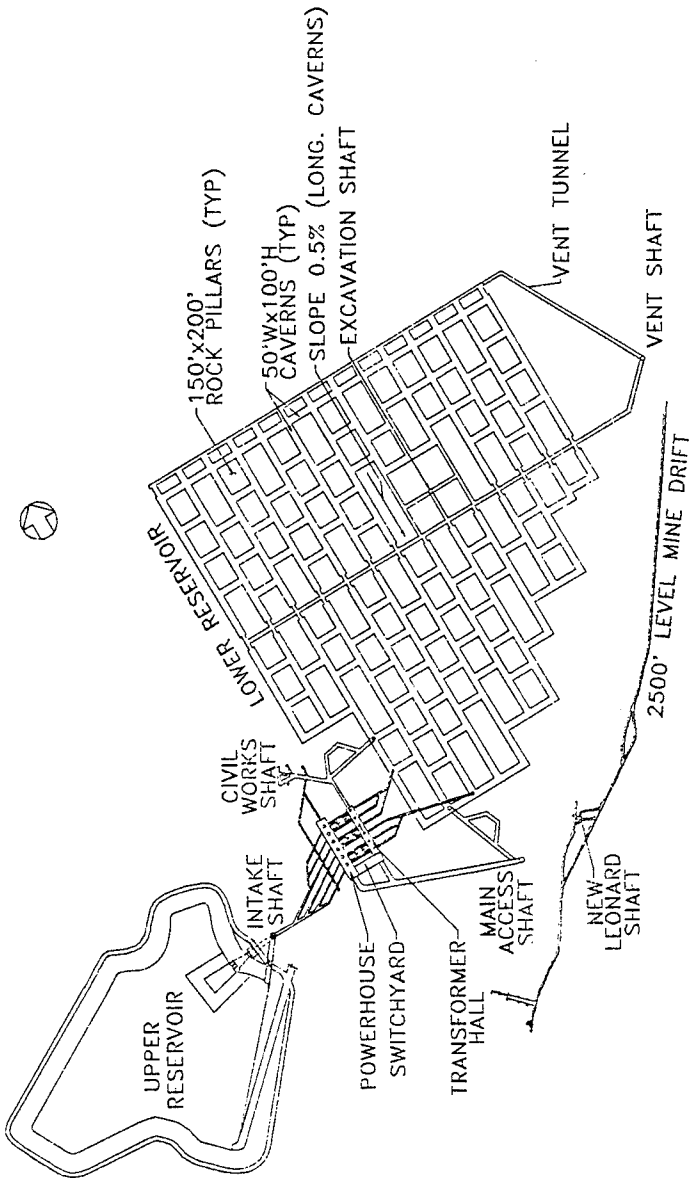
MT. HOPE WATERPOWER PROJECT - PLAN
